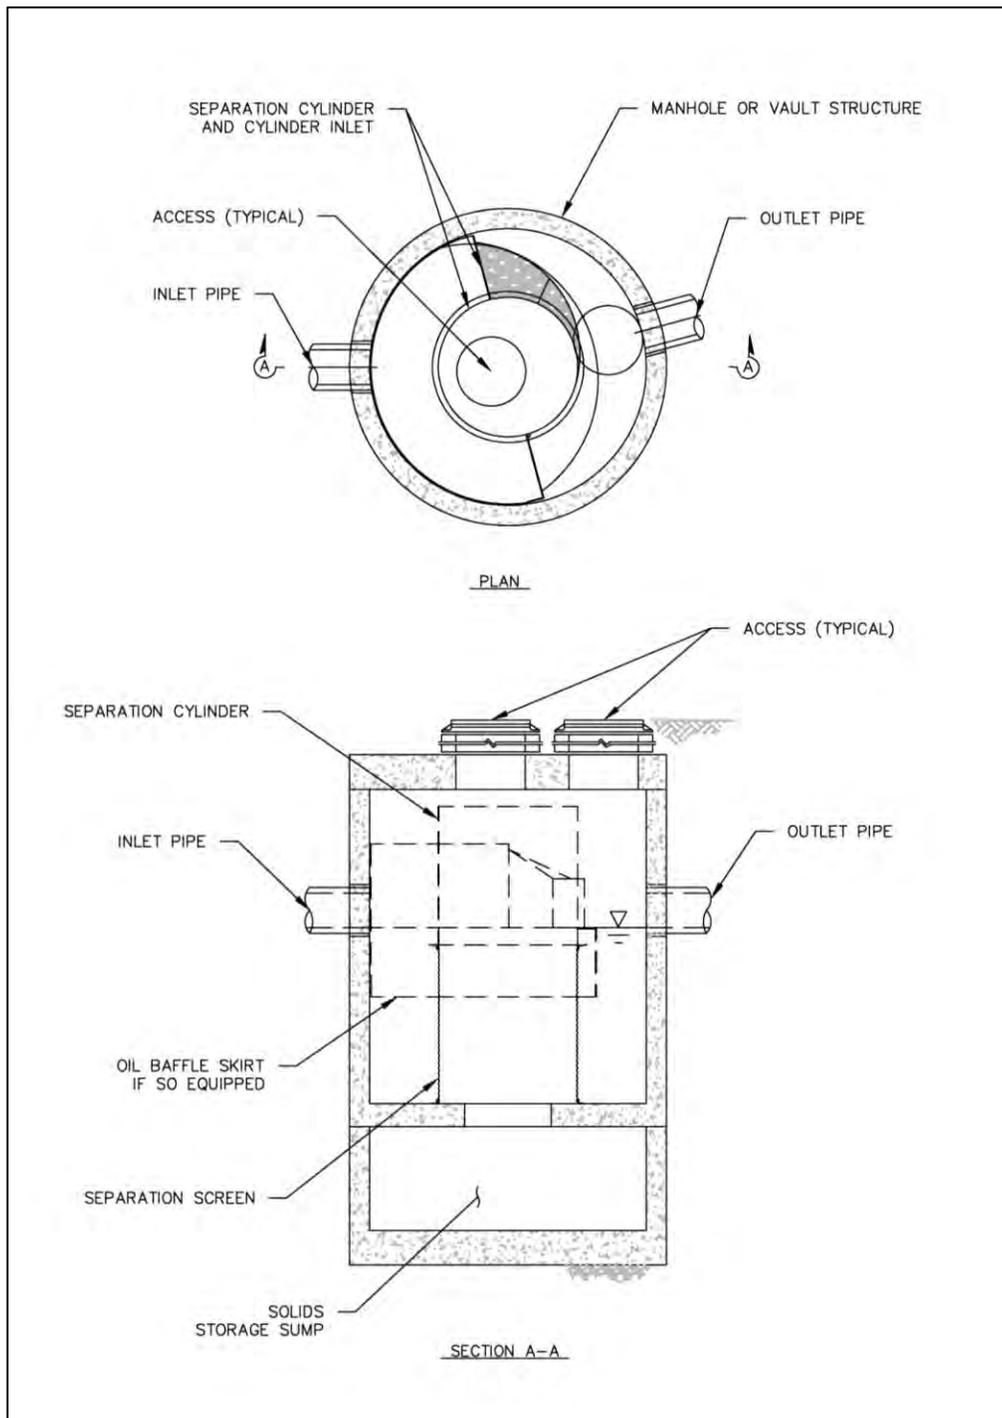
Hydrodynamic Separator Schematic Plan and Section View (Not to Scale)³
